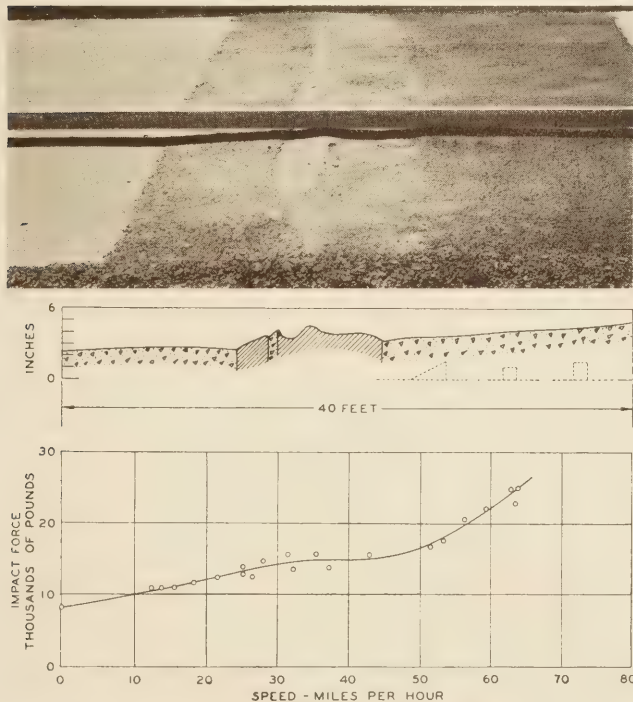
IMPACT REACTIONS PRODUCED ON A CONCRETE PAVEMENT AT A BAD JOINT WHICH HAS BEEN PATCHED WITH BITUMINOUS MIXTURE
